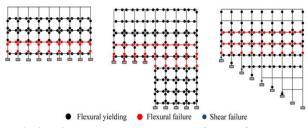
Hinge patterns at collapse for the four-story buildings (Surana et al 2018): (a) Flat land, (b) Splitfoundation building, and (c) Step-back building
